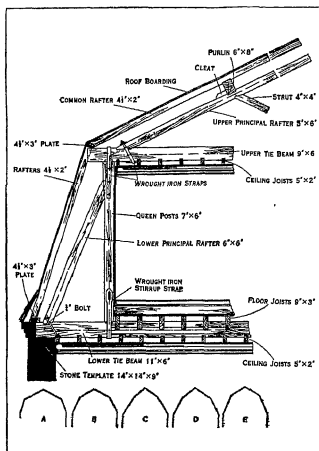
MANSARD ROOF TRUSS. DETAIL OF OUTLINE AS A, OTHER OUTLINES AT B, C, D AND E
